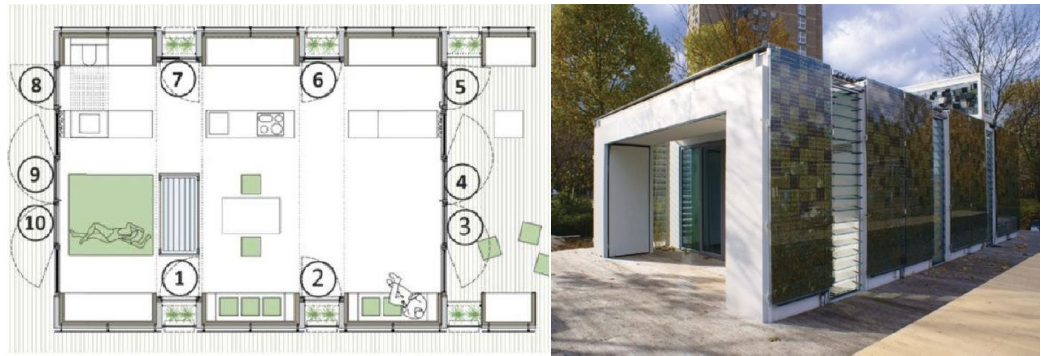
'Home +' floor plan, Outdoor photo (F. Babich, M. Cook, J. Cremers, G.Papachristou, 2017)
